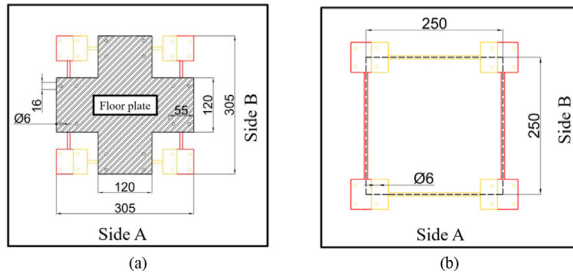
Top plan view of the building model (a) with floor plate, (b) without floor plate.
